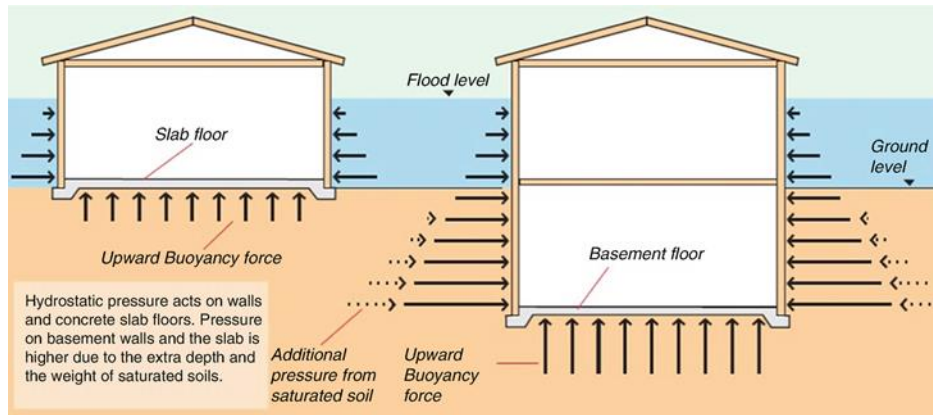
Buoyancy and hydrostatic forces on water-tight building (source: FEMA, 2011)
